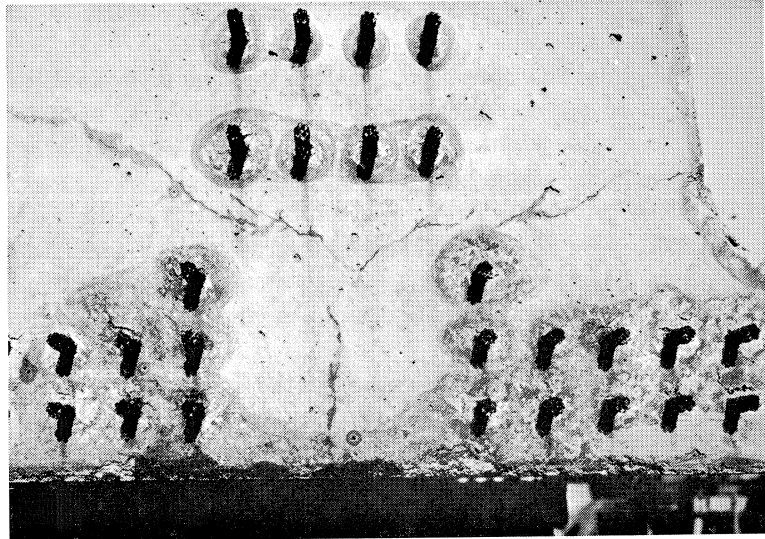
Cracks between concentrated prestressing forces at the end of a beam (prestressing wires arranged in groups).
